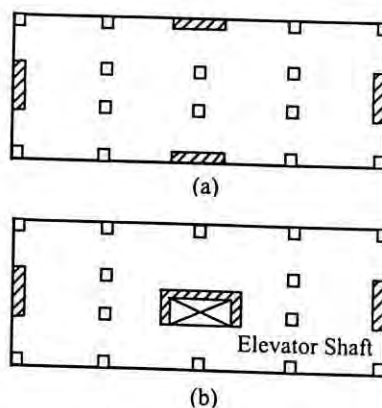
Plans of Structures with Shear Walls. (a) Separate Walls. (b) Incorporated into Elevator Shaft.
